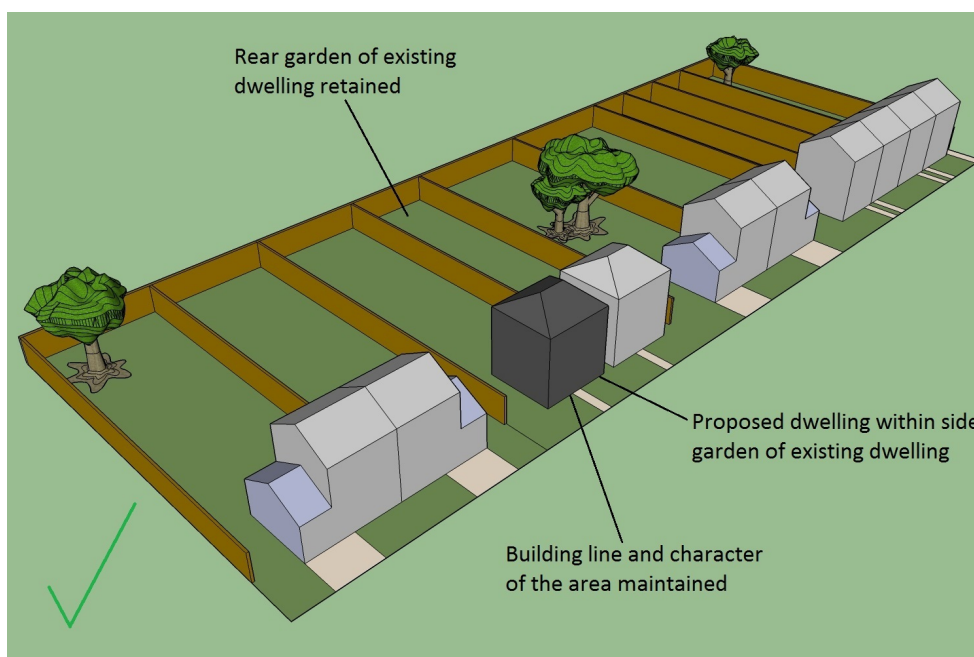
Appropriate infill dwelling proposed in side garden of existing dwelling
